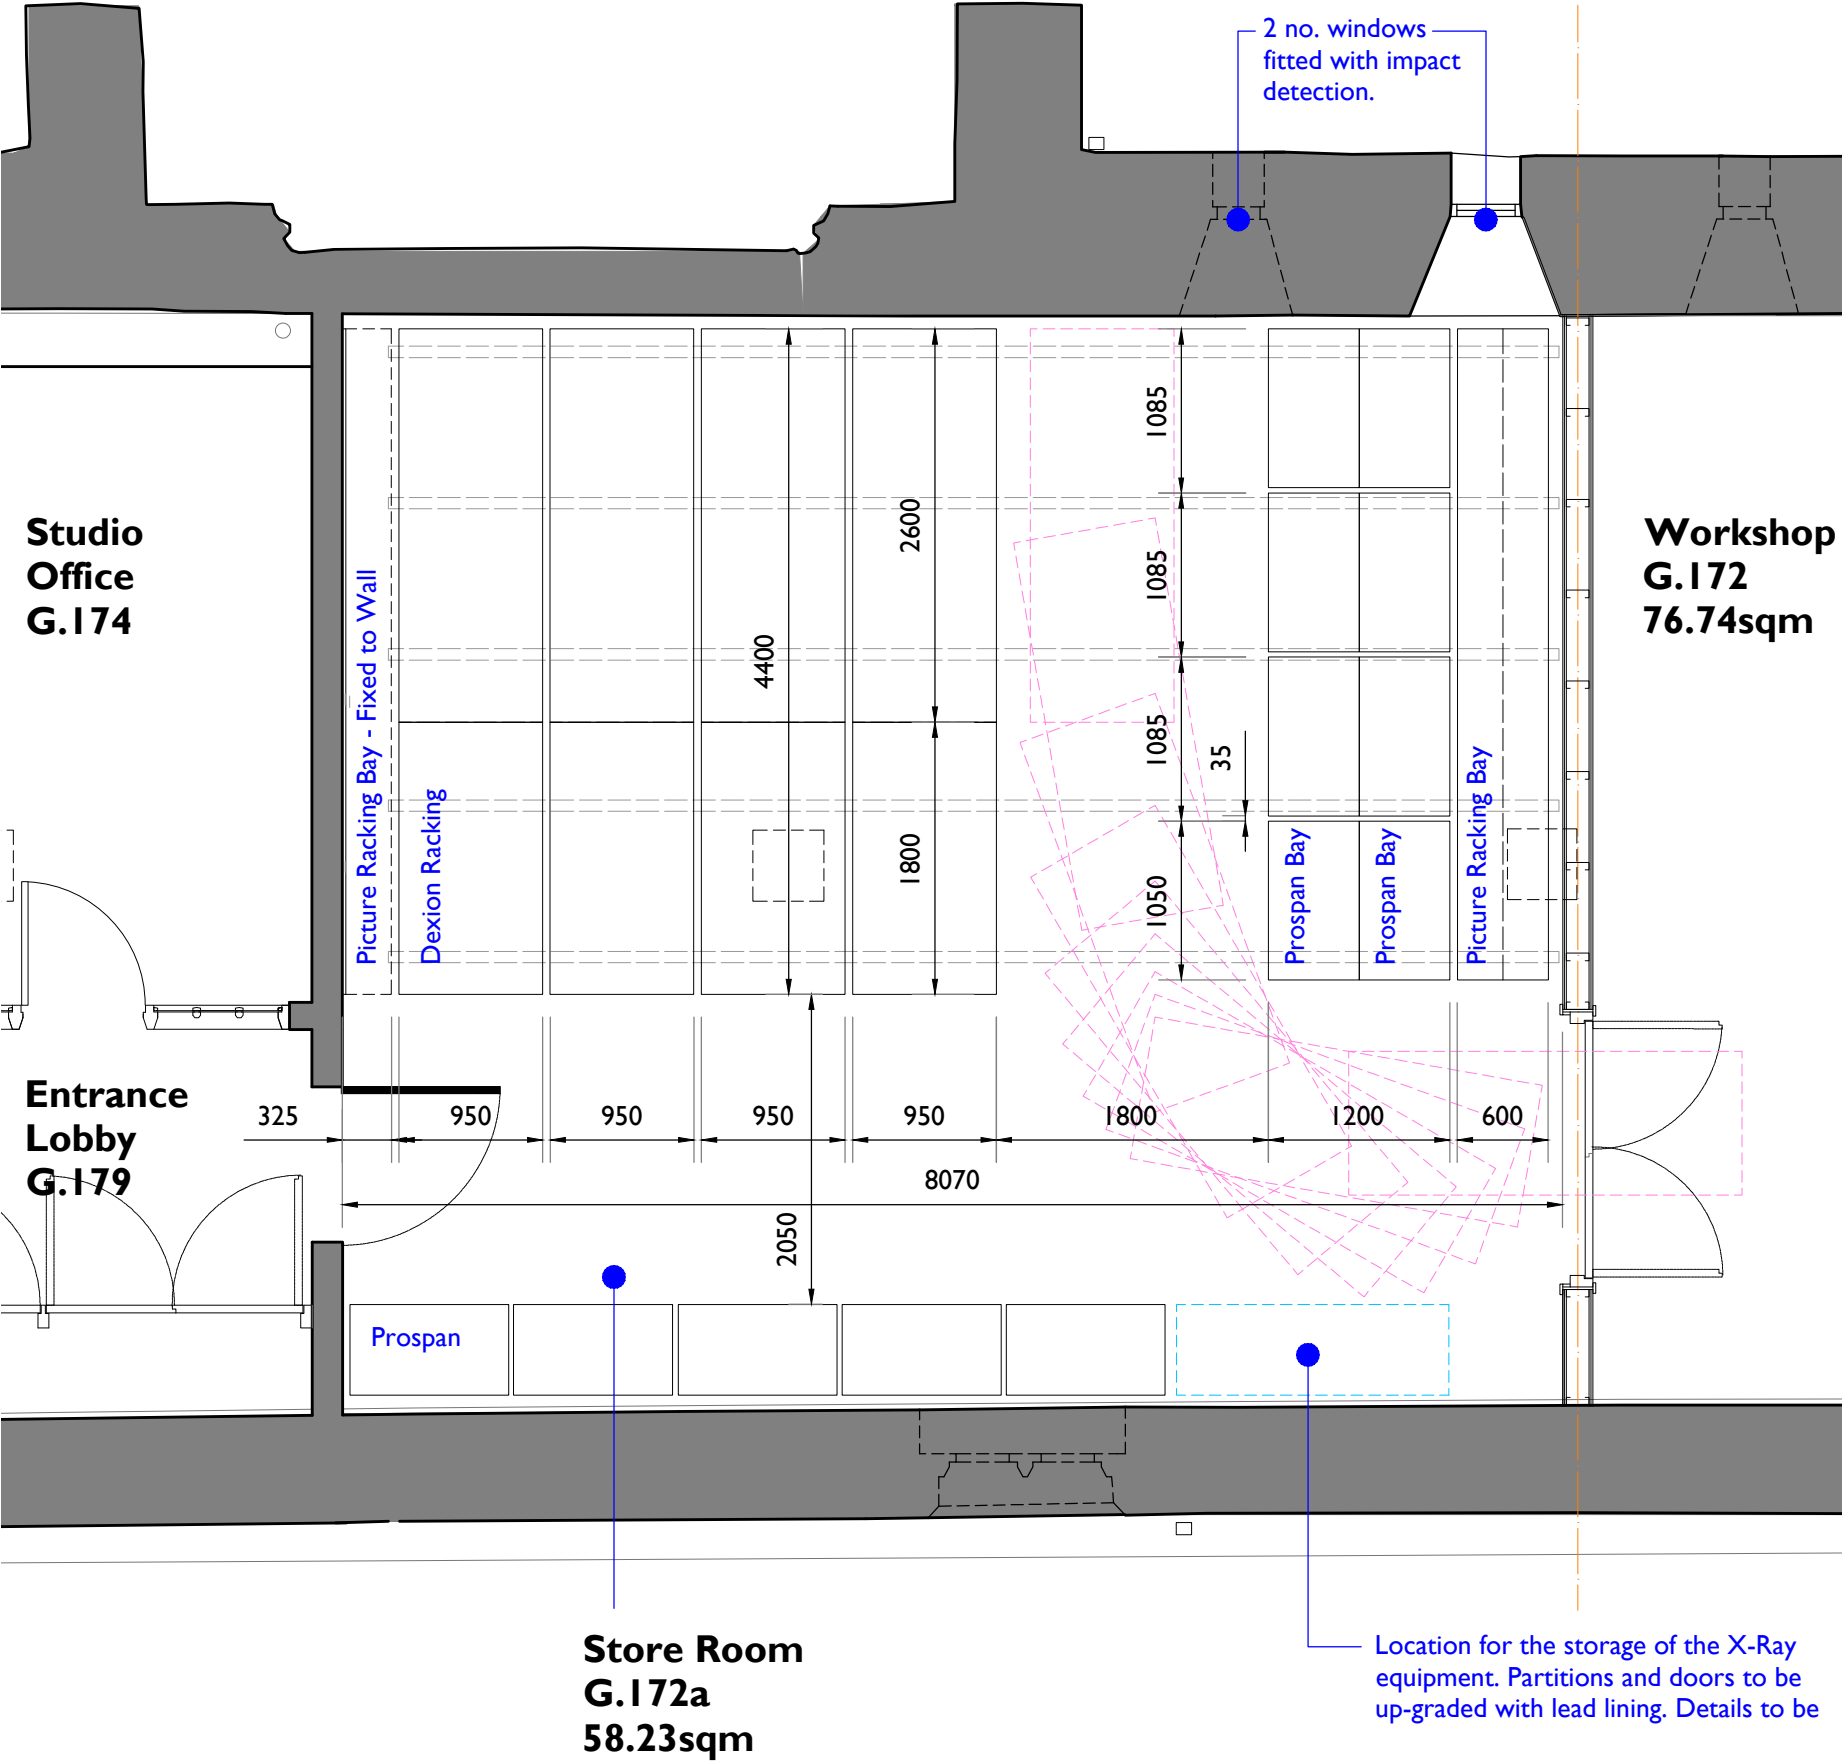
(above left): The artefact store can be reduced in size by the introduction of roller racking - as the proposed plan illustrated. The racking will sit on the existing concrete floor slab.
